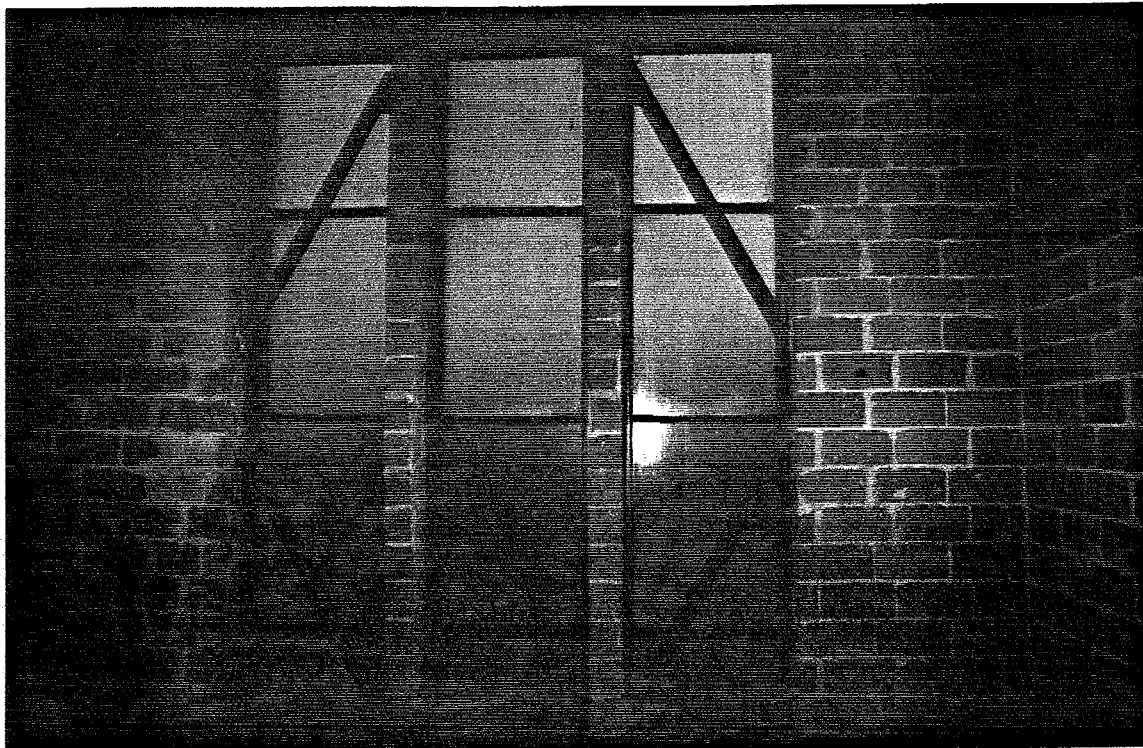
Inside view of cross-bracing and masonry walls of bell tower.
